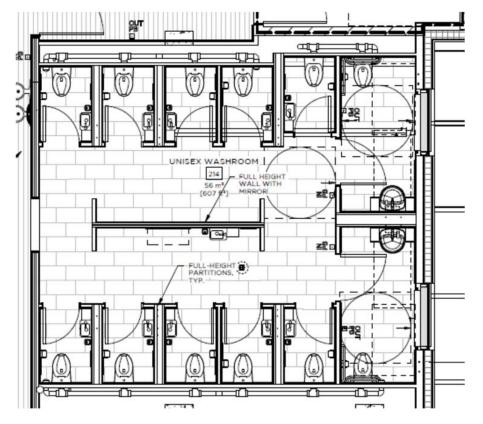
Washroom design on 2<sup>nd</sup> floor outside Performance Hall
